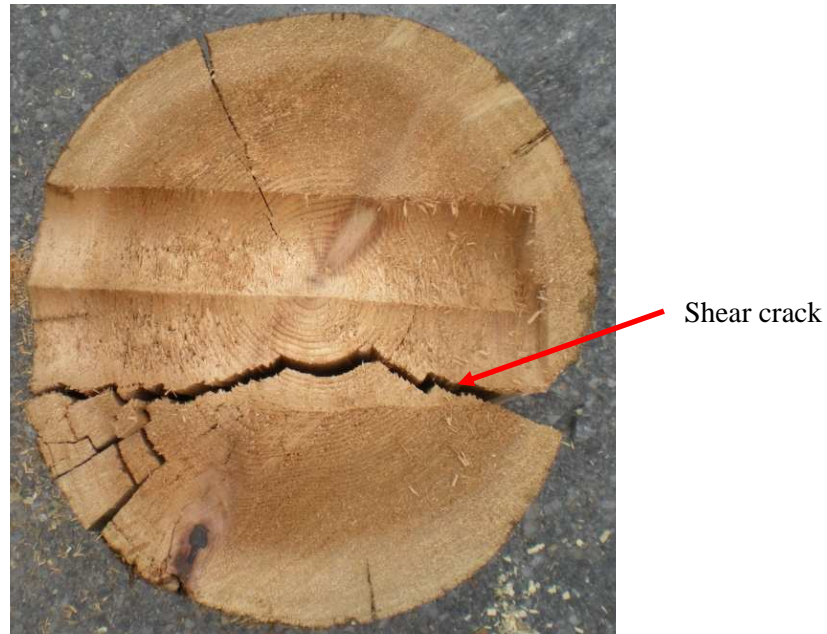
Cross-section of new pole specimen with neutral axis nesting damage (55-2-3).
